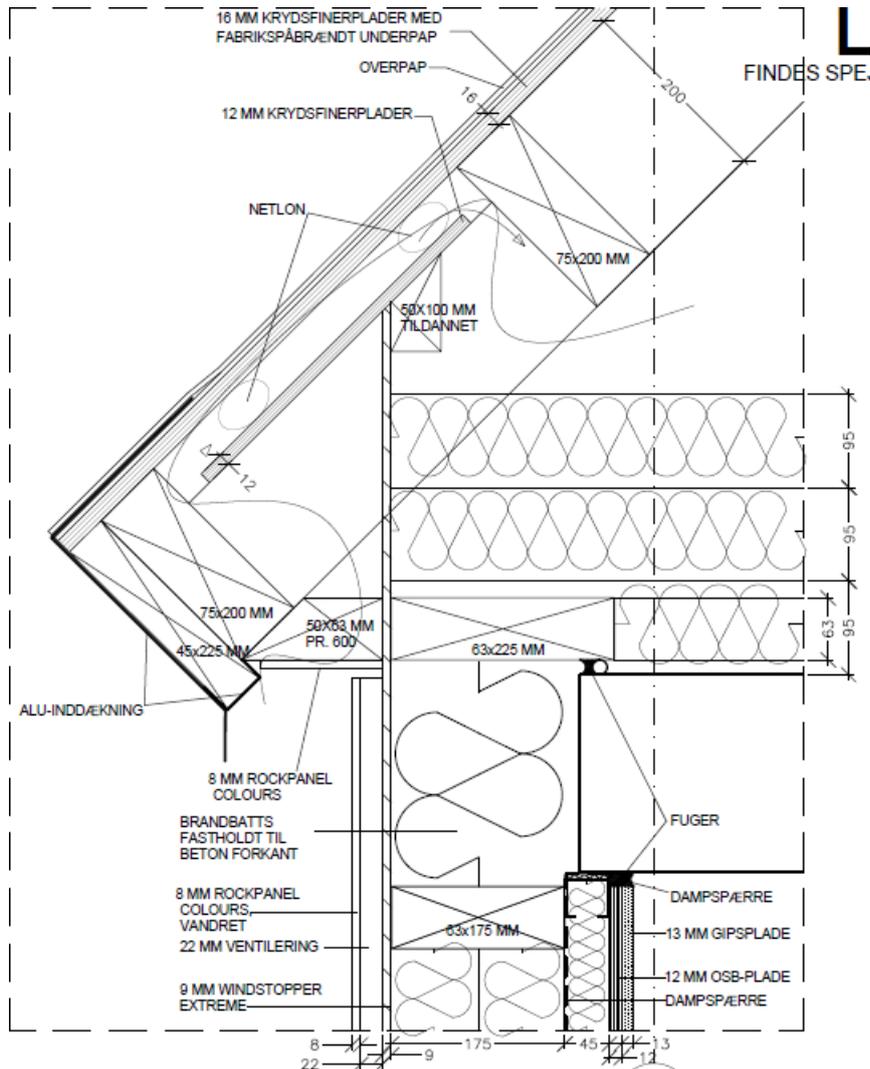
Vertical detail of roof and façade joint in a modern multi storey house. The roof is ventilated through openings in the horizontal boards at the eaves. The roof is insulated with 285 mm mineral wool.
